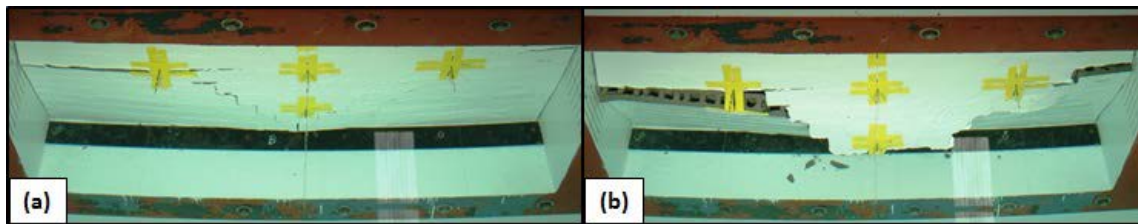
SW11. (a) The tear in the epoxy traveled diagonally from the first gauge on the left to the bottom gauge at the center of the wall. (b) Complete failure occurred when crack propagated the full width of the wall.
